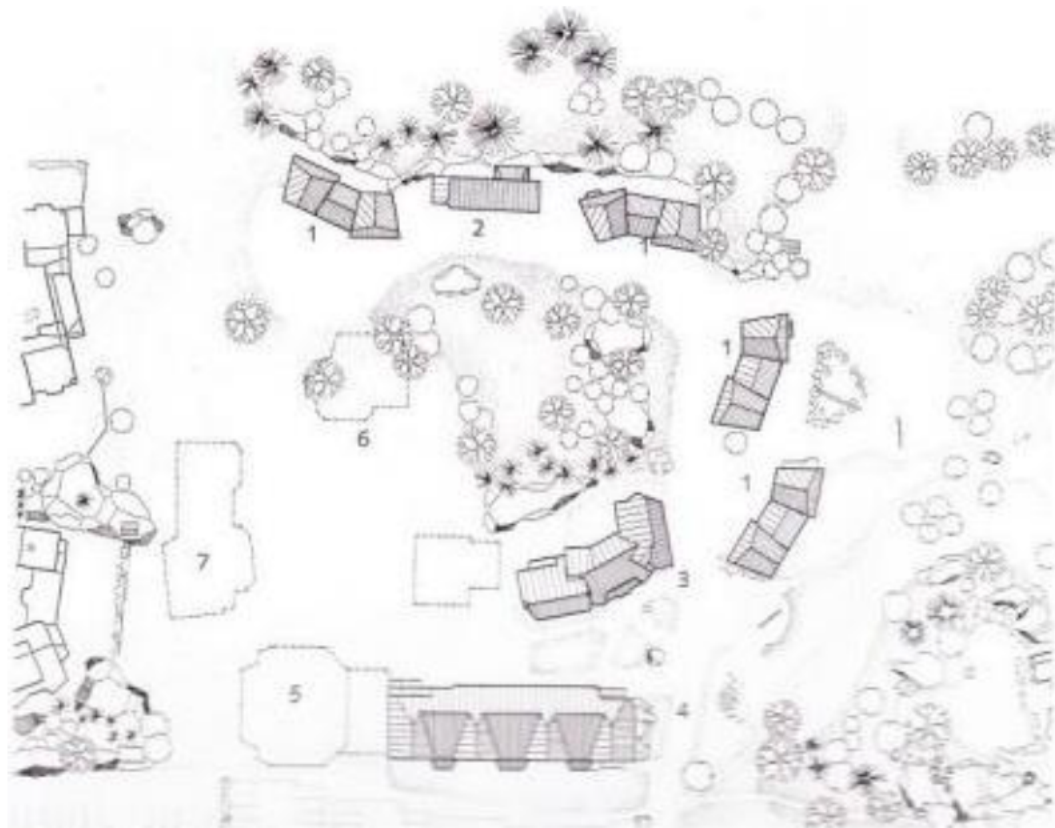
Orjan School Site Plan, Source: (Coates, Gary. Erik Asmussen, Architect. Stockholm: Byggförlagte, 1997. 28)
